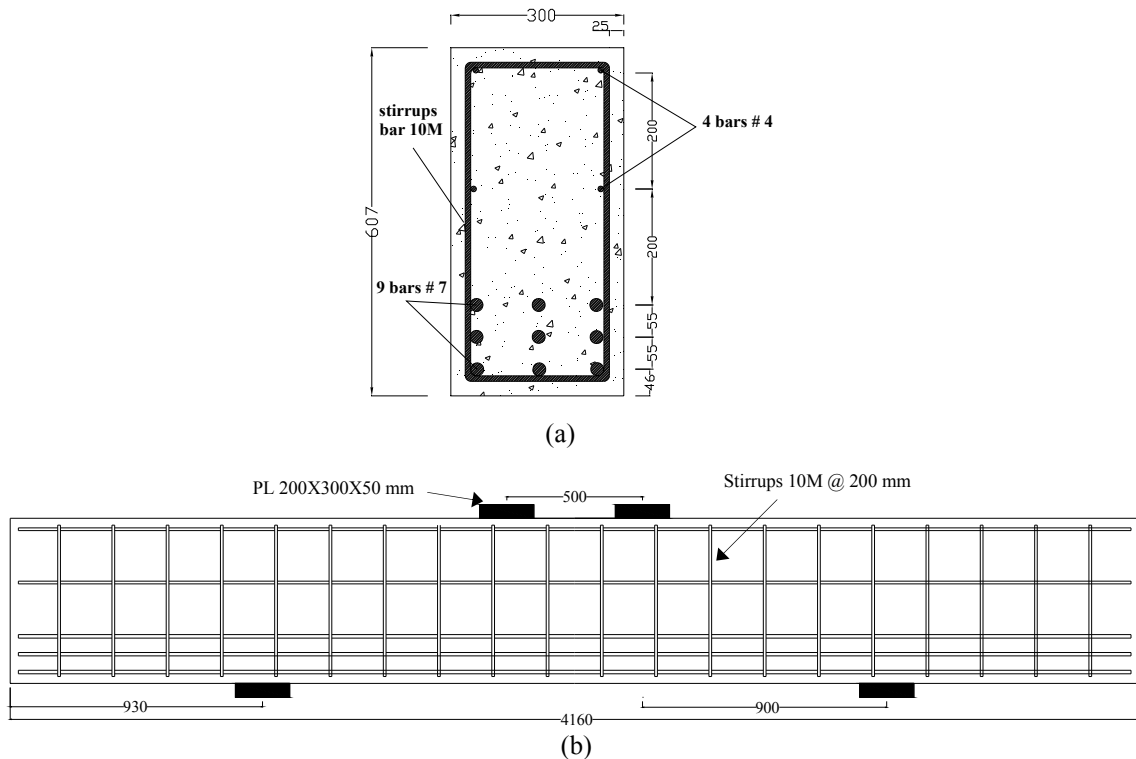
Beam MS2-3: (a) Cross section (b) Elevation
